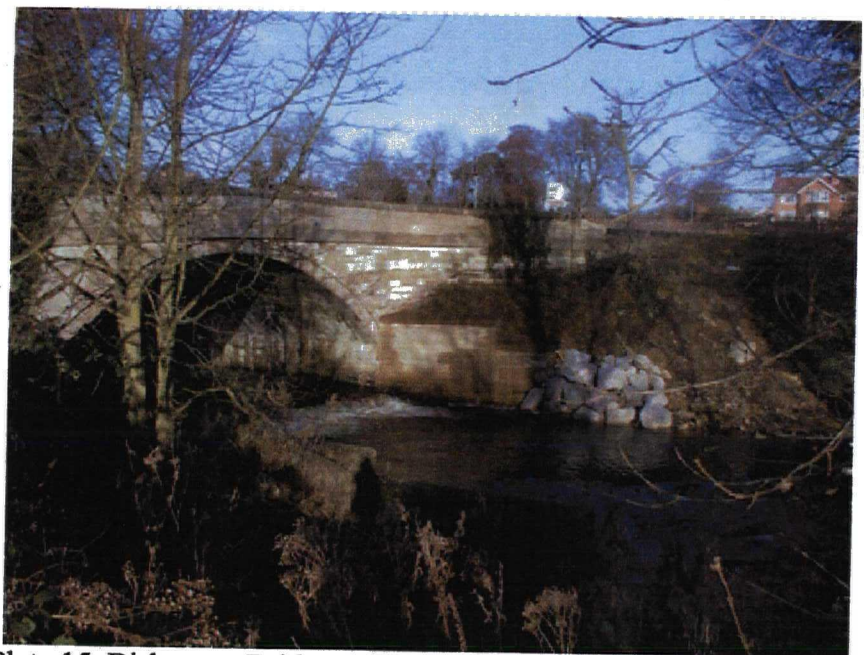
Bishopton Bridge, across the river Laver, downstream side
